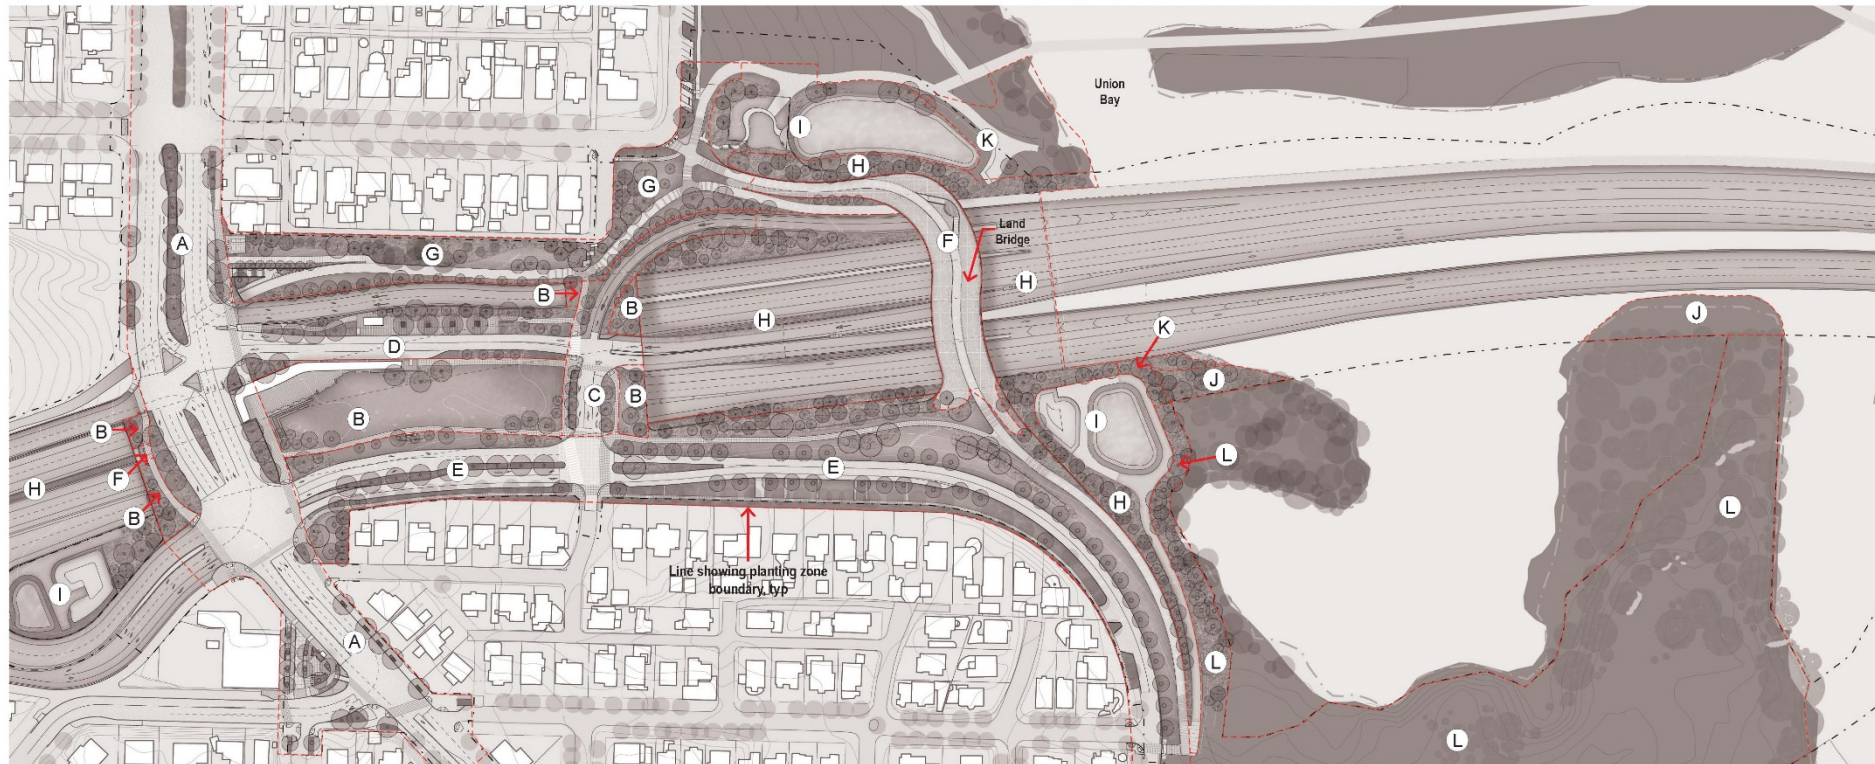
Montlake and vicinity planting zones key plan
